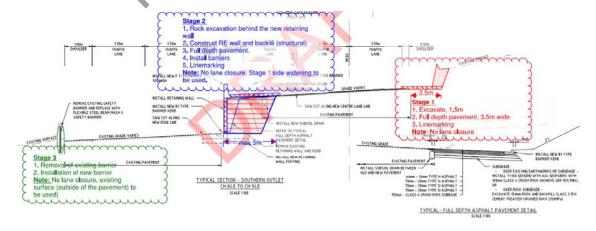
Typical section – Southern Outlet Ch. 840 to Ch. 940
